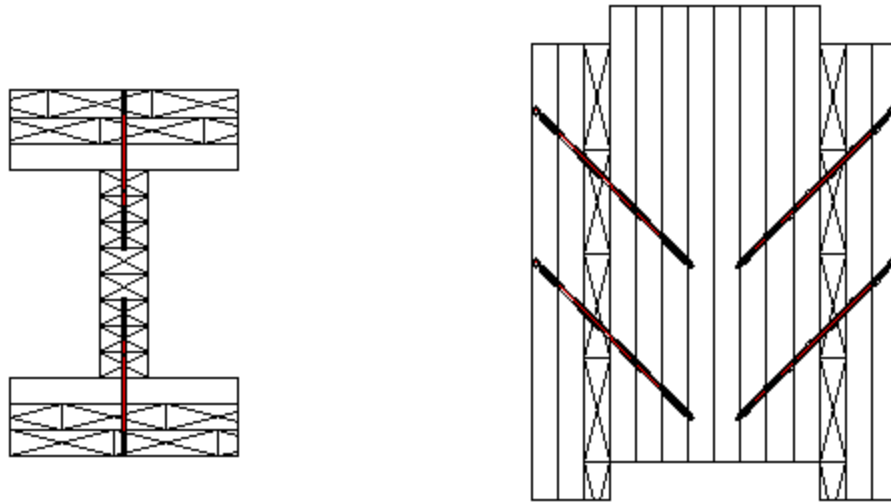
Test #3 – ASSY Screws at 45 Degrees
